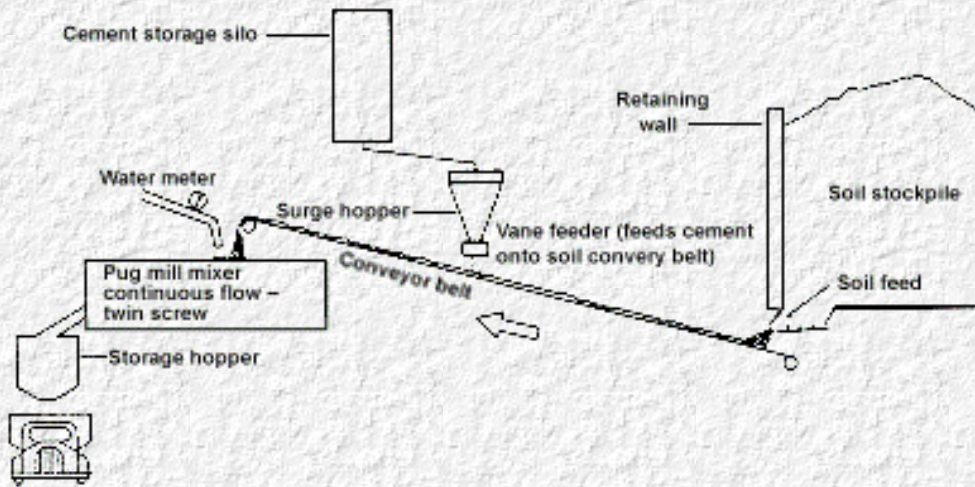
Schematic of Continuous Flow Mixing Plant for Soil Cement (Hansen)
